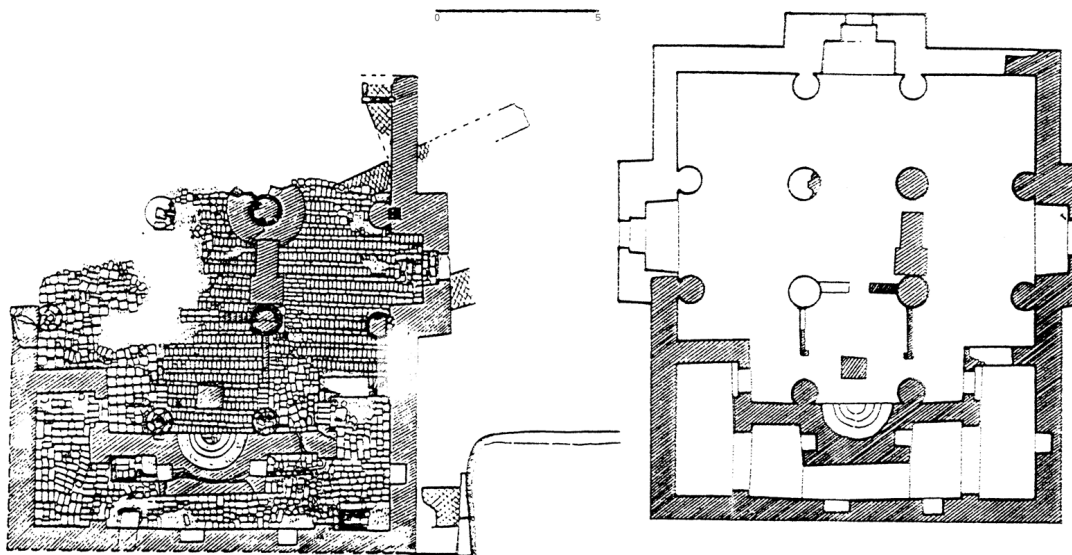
Pillar Church (1:200). A. Documentation plan. B. Reconstruction of complex.
